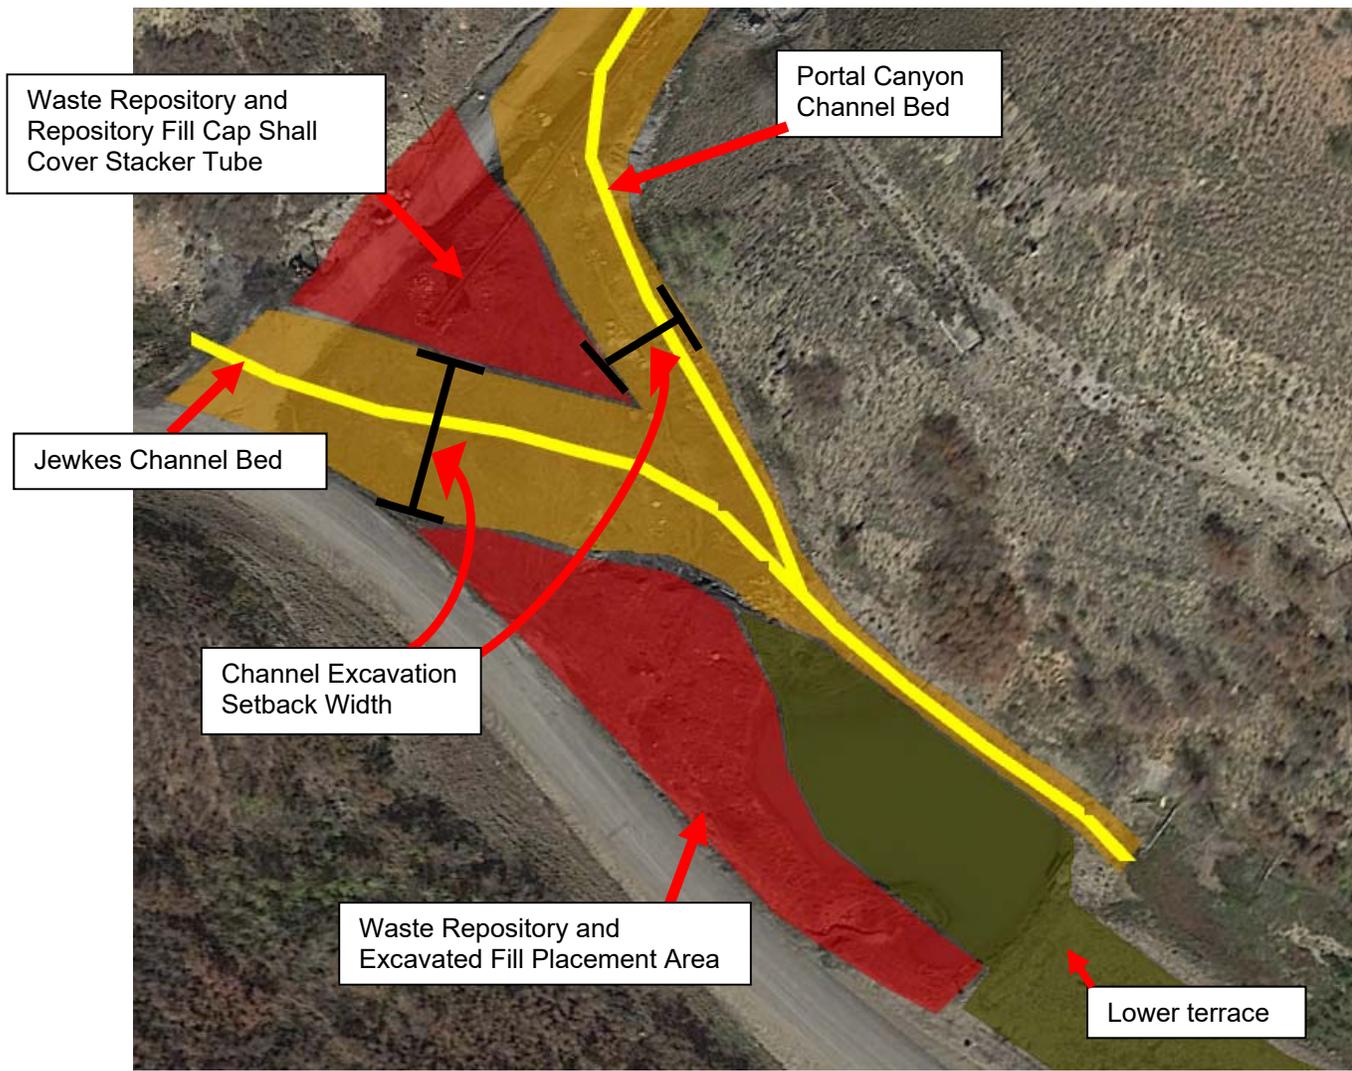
Red polygon shows the location of the waste repository and excess excavated fill area. Waste shall be covered with a minimum of four foot of clean backfill.
